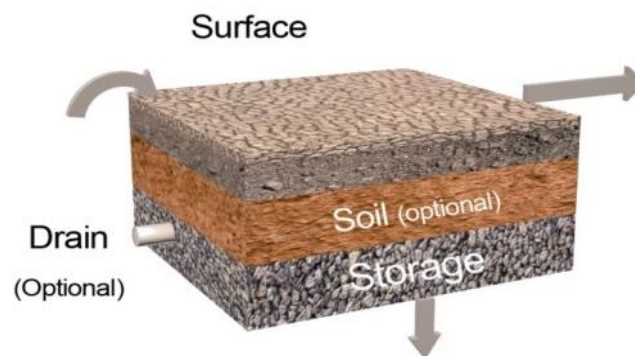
Sample figure of a Permeable Pavement modeled in SWMM.
